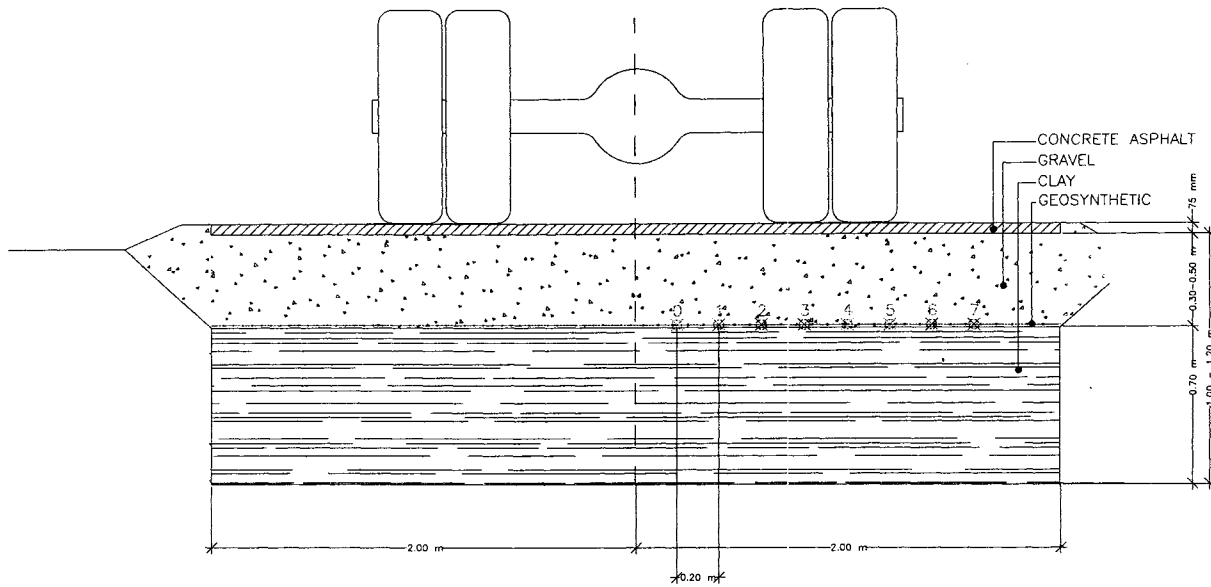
Cross section of the full scale in ground test road and strain gage layout
